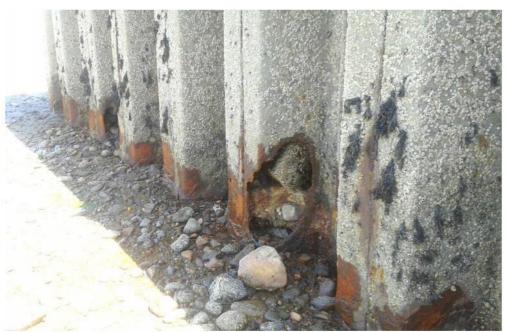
Northern bulkhead area showing low tide level corrosion holes in the sheet piling and likely source of backfill wash-out
